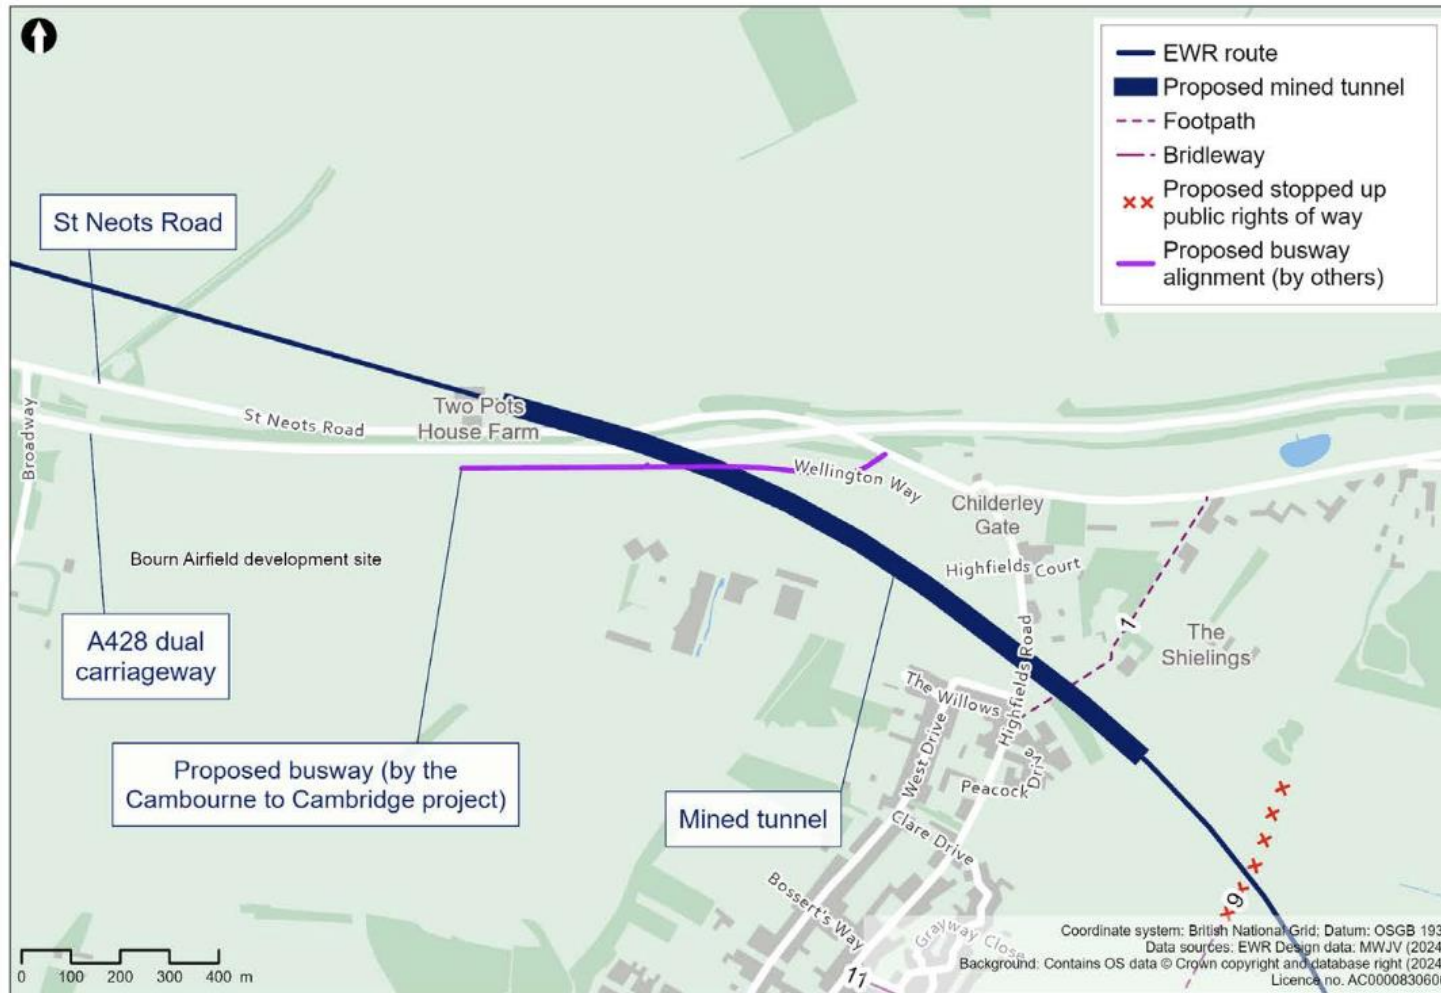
Map illustrating EWR proposals in the Cambridge route section (Figure 31 from EWR YSWD report)
